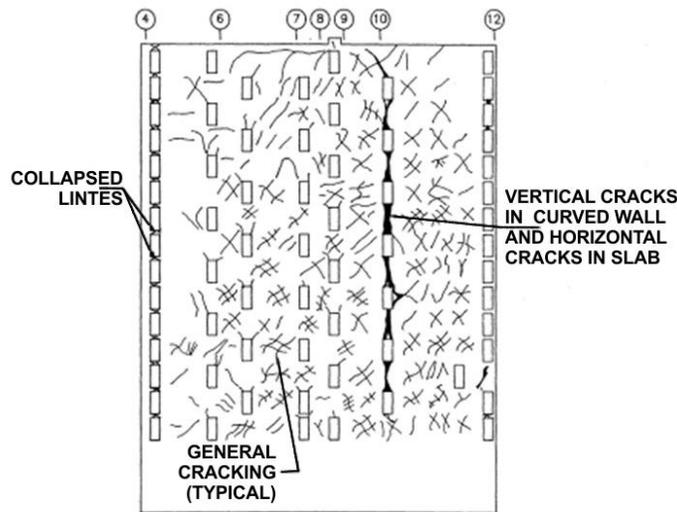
Brittle failures of coupled beams at the shear wall with staggered openings from Hanga-Roa building, Chile, 1985 [2.22]
